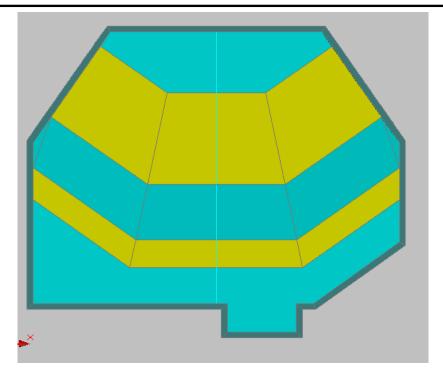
Lecture Hall Model – Plan View of Ceiling
